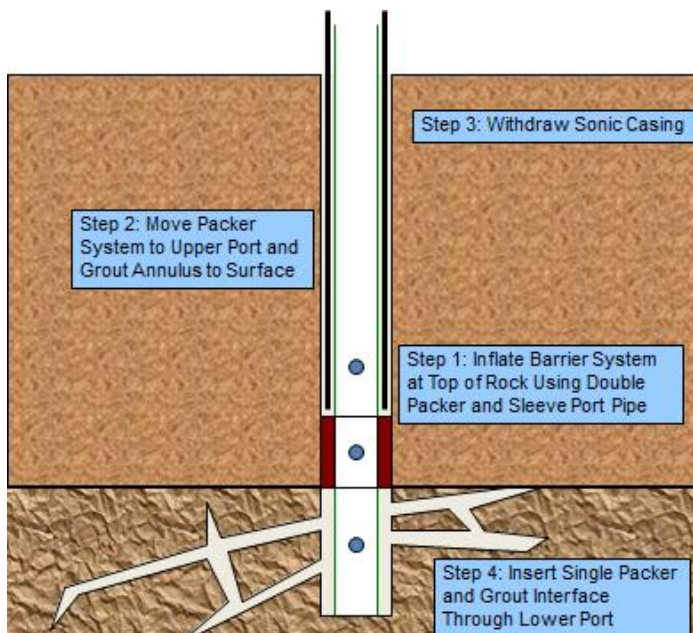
Separation of embankment and foundation with the use of a barrier bag.
